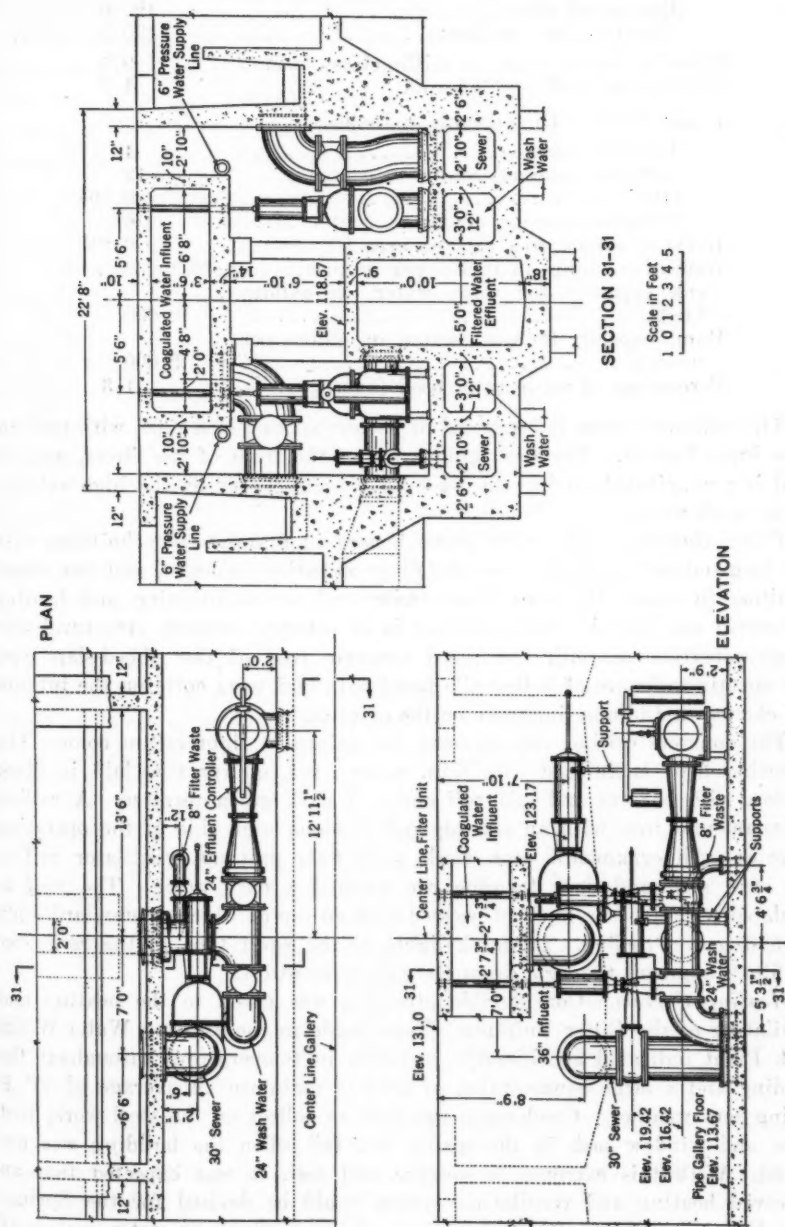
PIPE GALLERY DETAILS, FILTRATION PLANT
